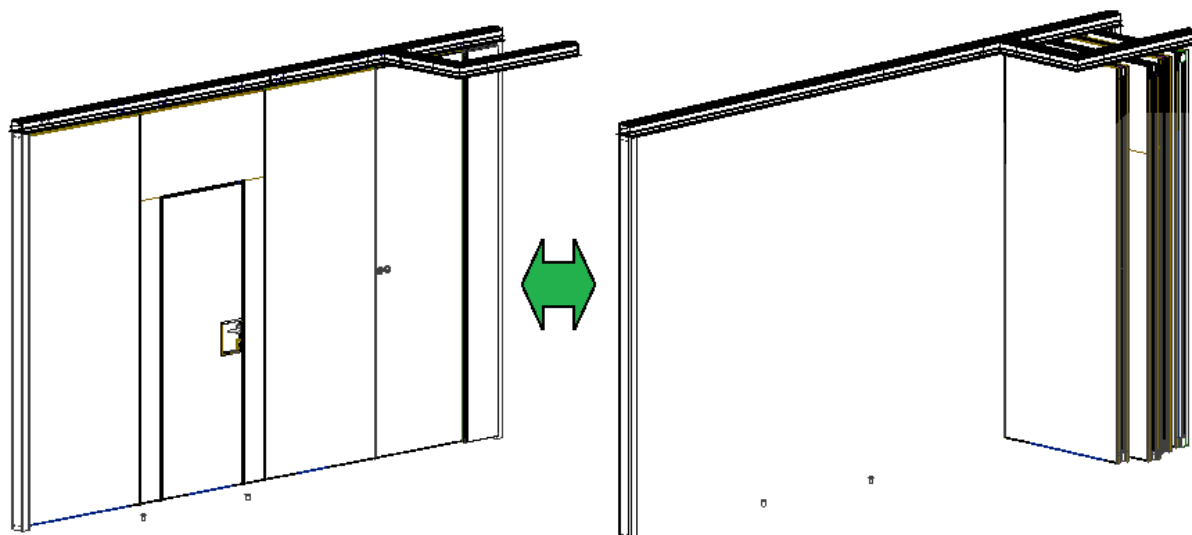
Layout of panels in a 2-point suspension wall with a parking space
